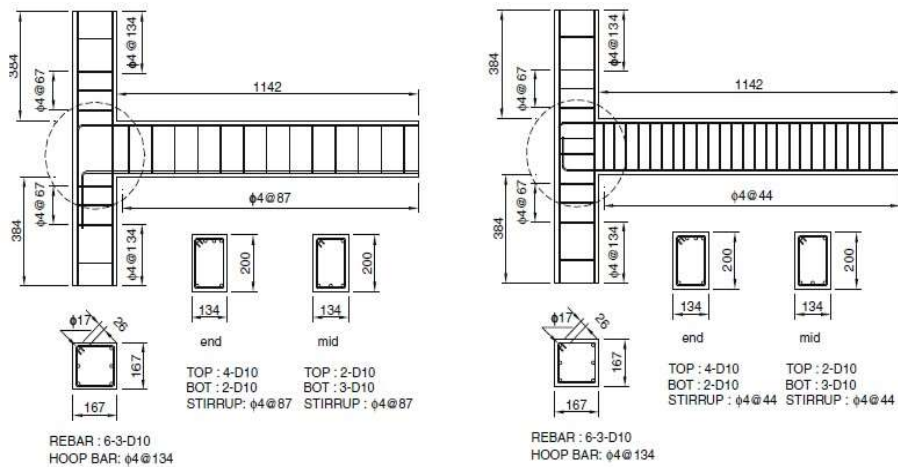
unreinforced joint and (b) reinforced joint Details for the specimens [13]
